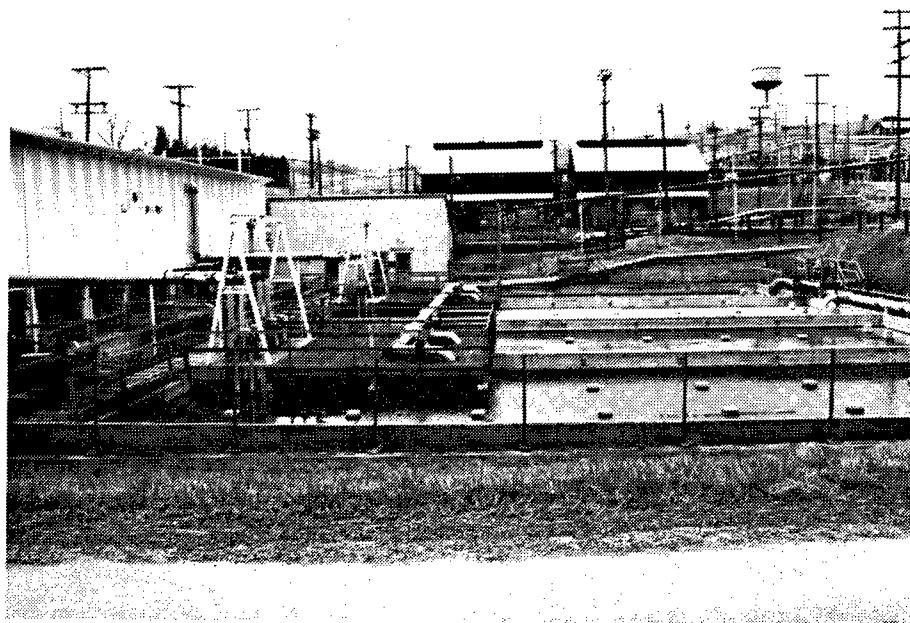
Building 1025: Poacher and Blending Settling Pit Pump House. The large structure on the left is not a part of this building.
